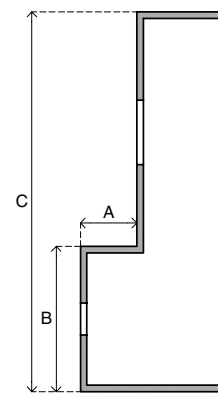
Articulated walls with major openings (where wall height exceeds 3.5m)
